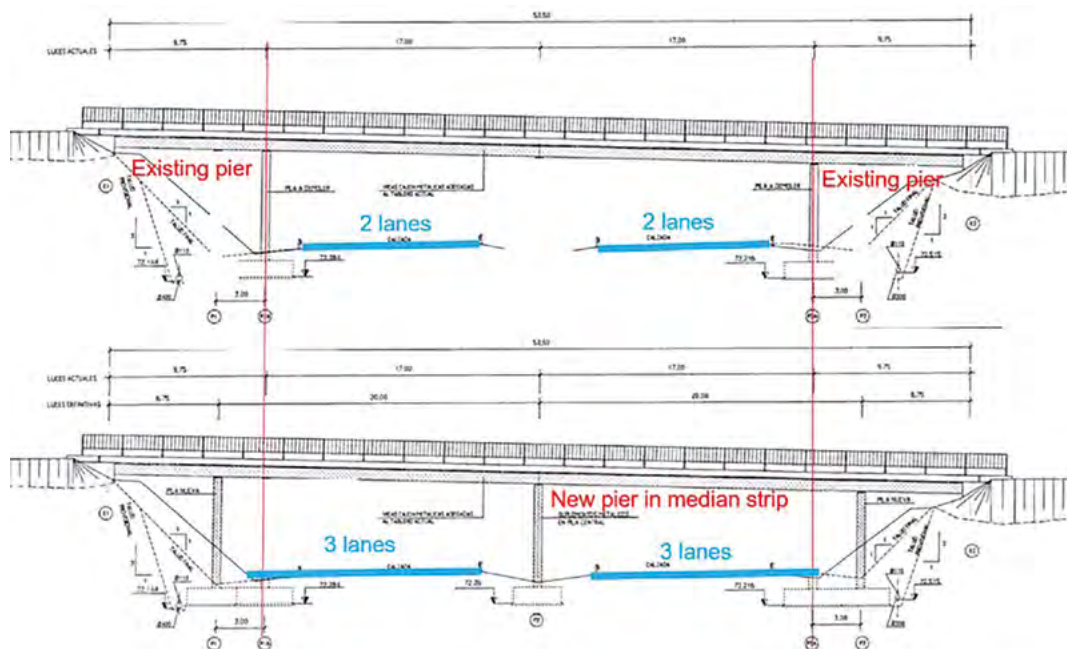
Layout for overpass enlargement with new pier in the median strip of the highway.
